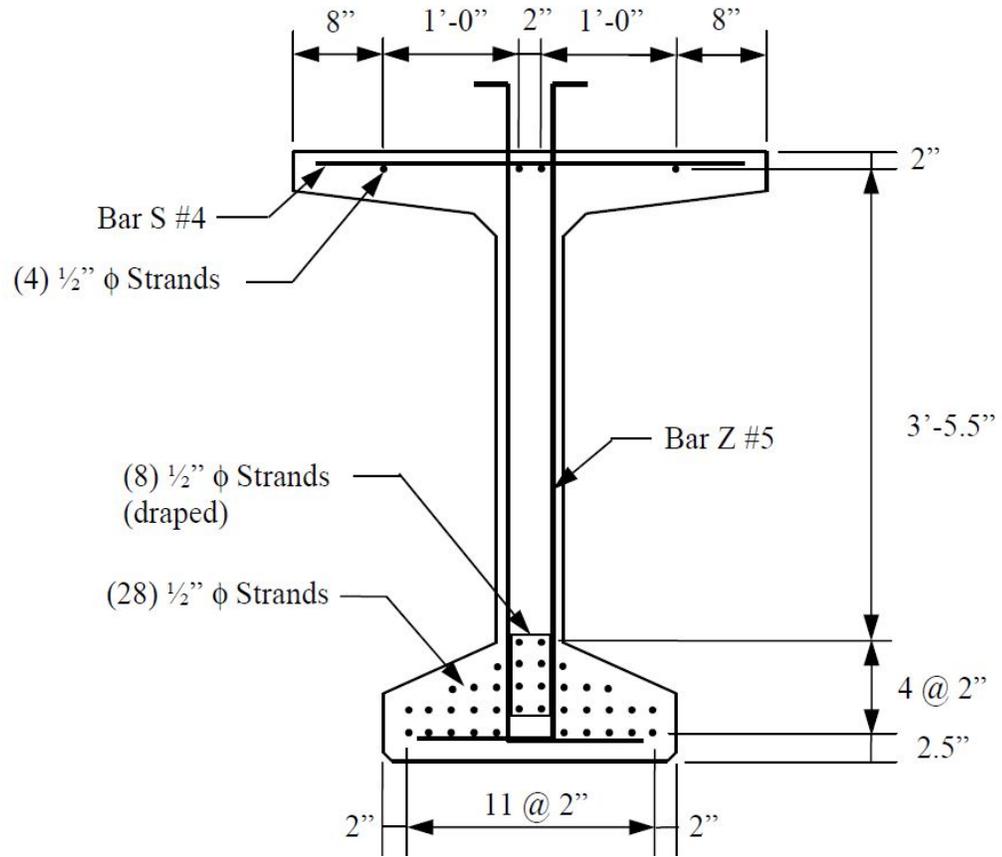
Mild steel and strand arrangement for BT-54 girder at midspan
